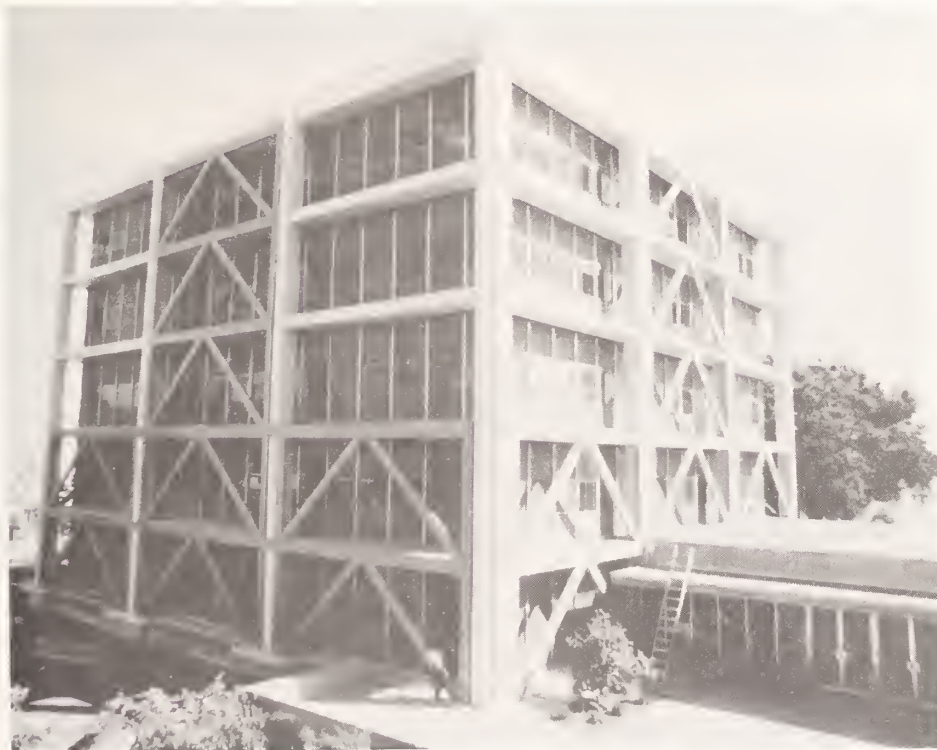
Building 113, after major seismic upgrade showing "K" brace frames.
